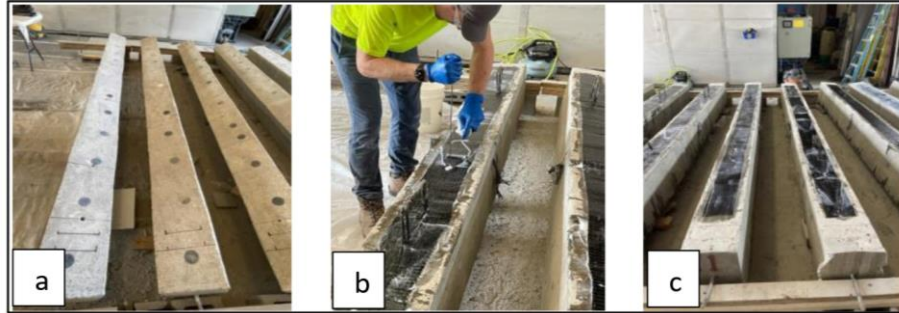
(a-c) RC Beams during Surface Preparation and CFRP Installation and Anchoring.
